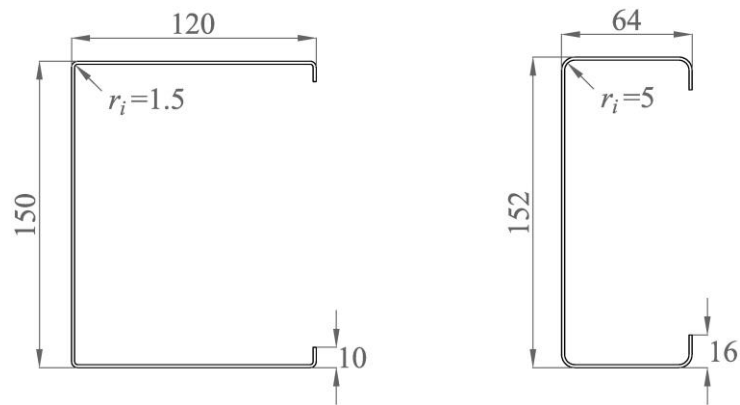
Dimensions of the lipped channel sections designed for testing (in mm)
